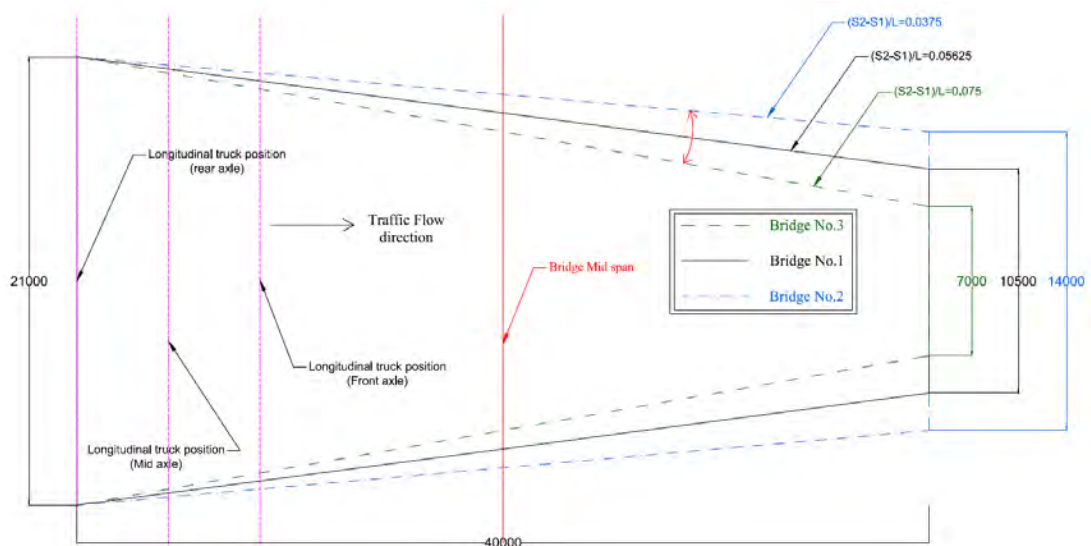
Bridges B1, B2, and B3 plan view - Shear
